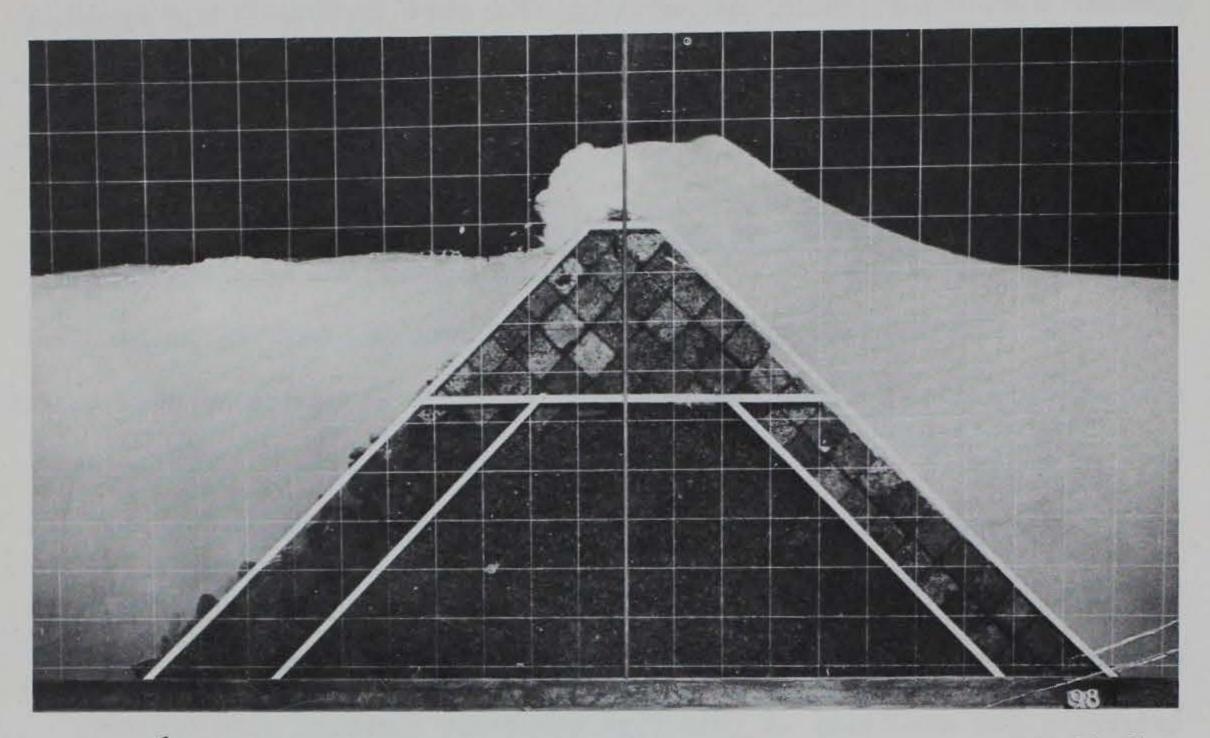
Stability of masonry-type breakwaters, 10-sec waves, 30 ft high, attacking a masonry-type breakwater constructed of 36.4-ton concrete cubes, specific weight 2.8, placed on 1-on-1 slope
